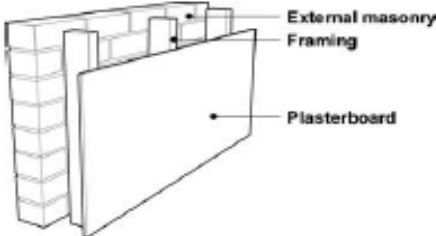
TOTAL R-VALUE FOR TYPICAL WALL CONSTRUCTION — continued
